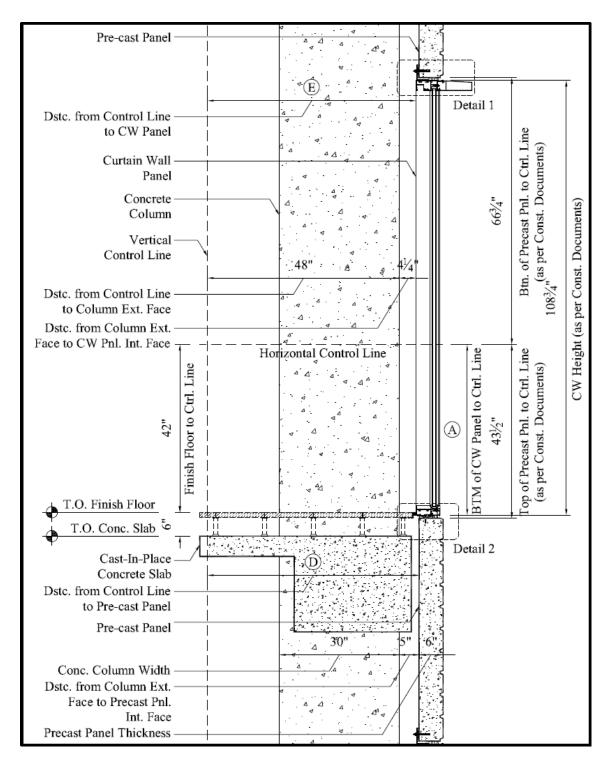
Measurements on partial façade section from 2nd to 7th floor as per construction documents. Letters A, D, and E denote the location of the cladding systems with respect to the control lines. Adapted from Dietzmann, J. M., Jr. (2014).
